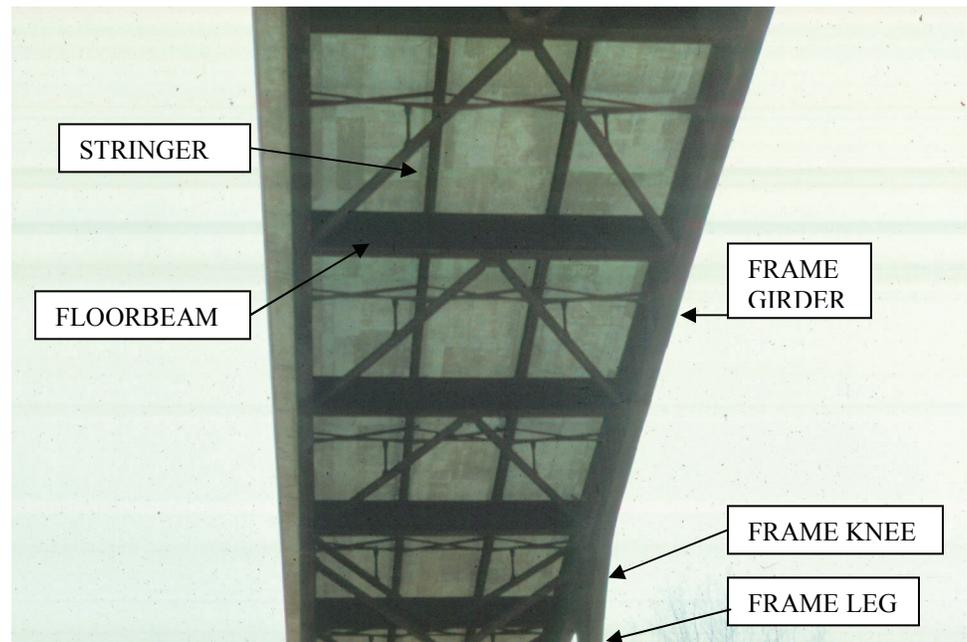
Frame Members, Floorbeams, and Stringers
